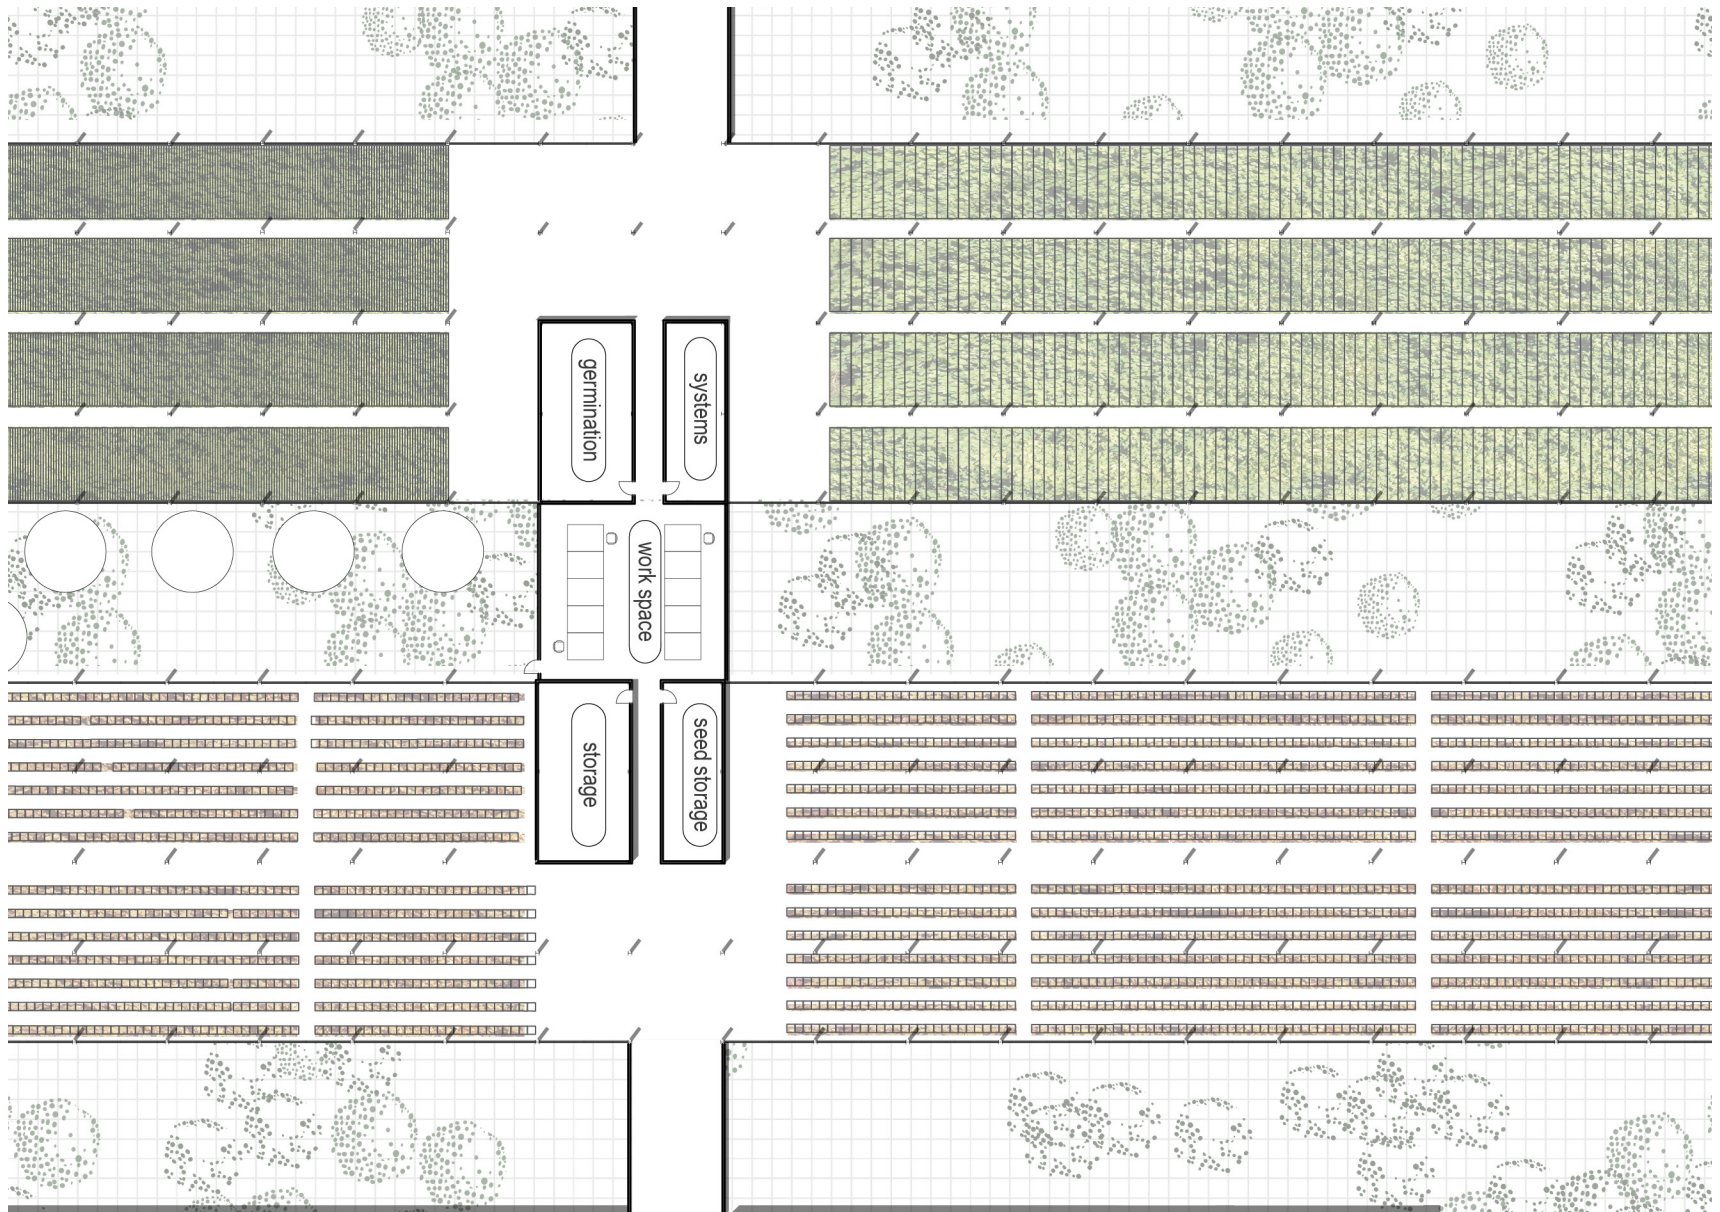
Greenhouse and Workroom Plan, 1:500
